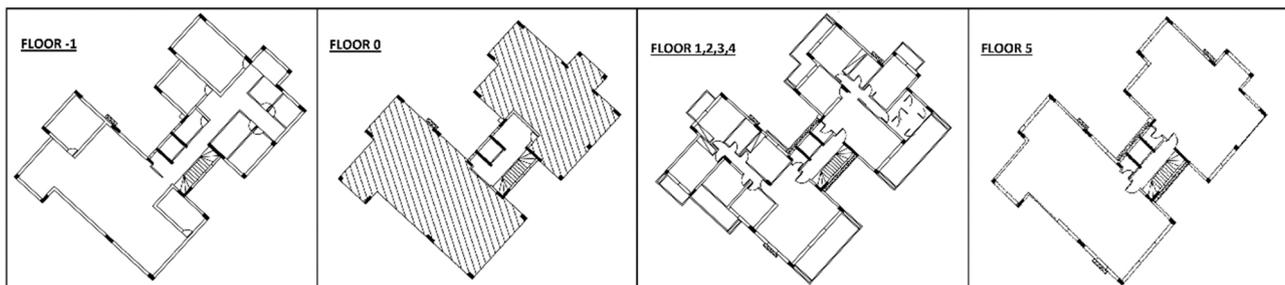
Floor plans of the underground floor, the ground floor, first, second, third and fourth (identical) floors and fifth floor of Building 1, at the scale of 1:200 (Andritsou et al., 2022).
